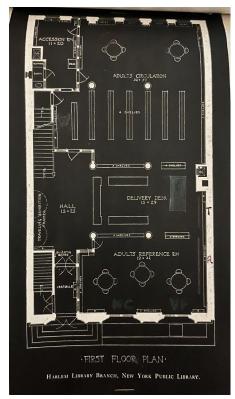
First-floor plan of Harlem branch library. Thakore, A. V. Survey of the 115th Street branch of the New York Public Library, 1950.
